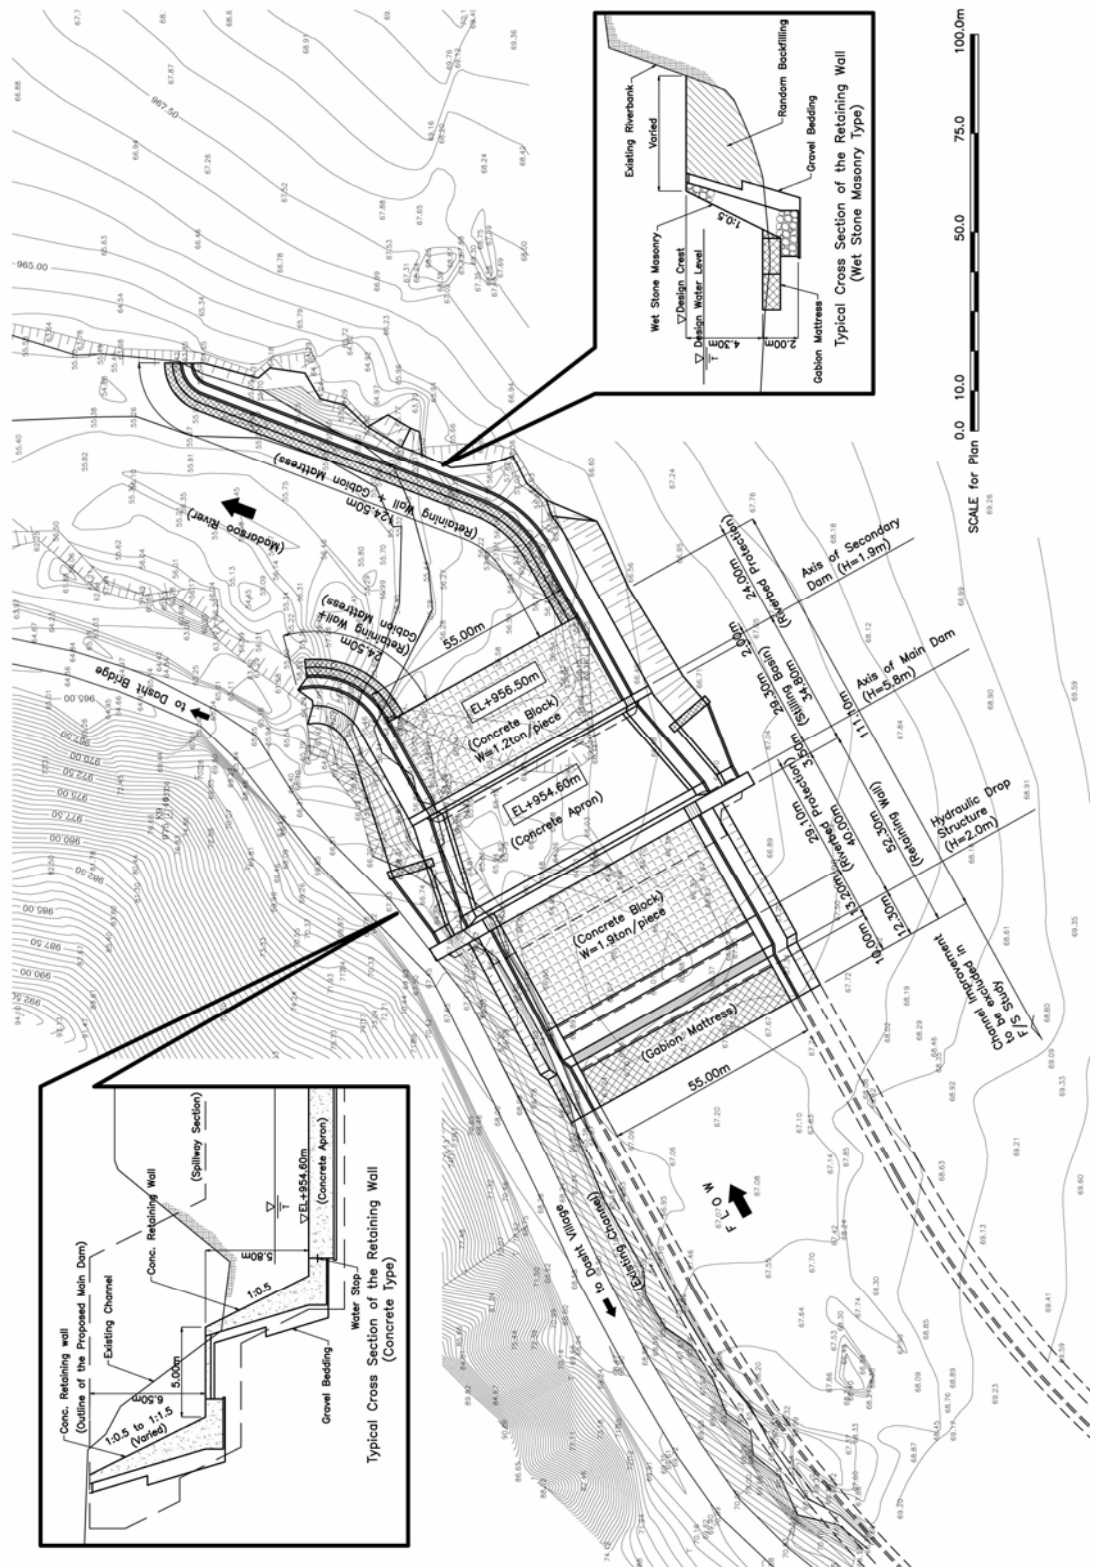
Plan of Proposed Riverbank Stabilization Works
